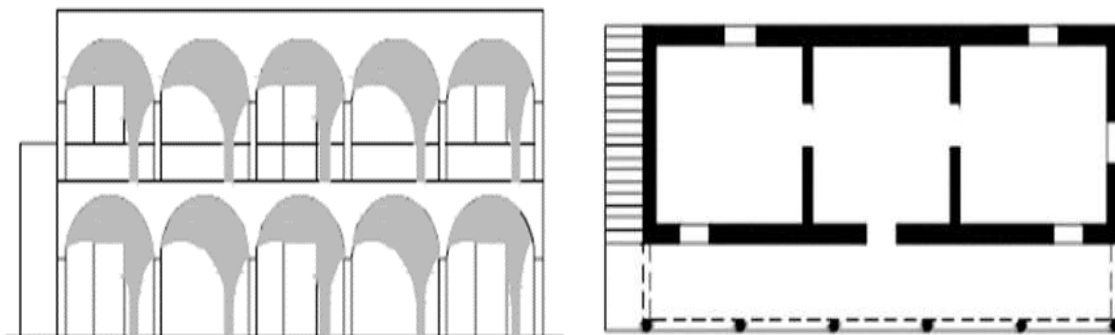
Sectional view to a traditional house from a Palestinian village near Ramallah city. Note the thick walls and domed roofs. [22]
